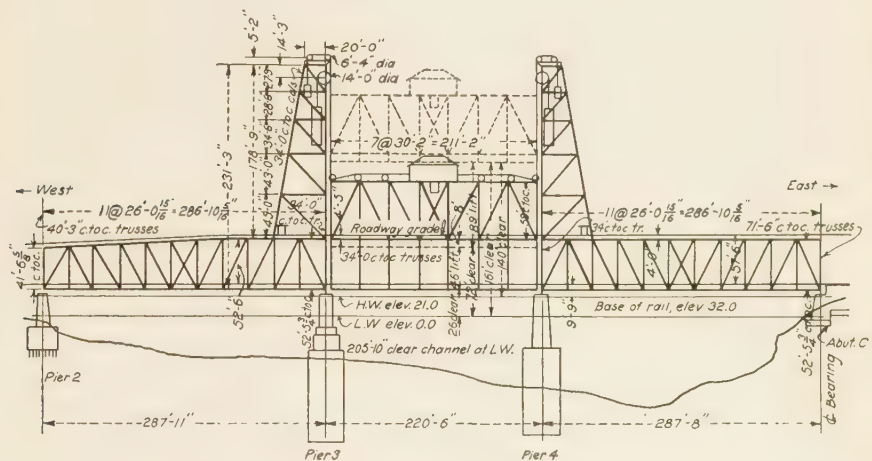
O-W. R. R. & N. Co.'s lift bridge over the Willamette River at Portland, Oregon.
